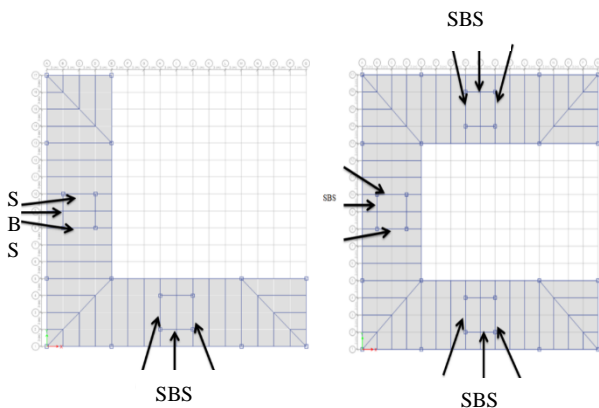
Plan showing the location of the secondary bracing system for L shaped and C shaped diagrid structure
